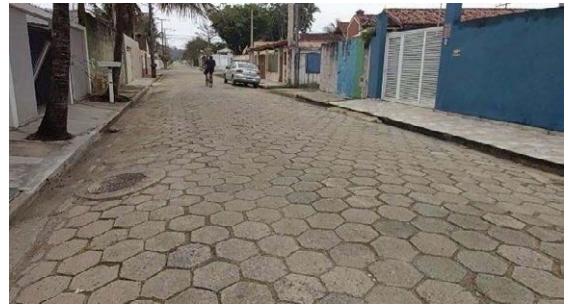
The paving of the streets adjacent to the pumping station are made of hexagonal blocks, gutters and manholes for rainwater collection.
